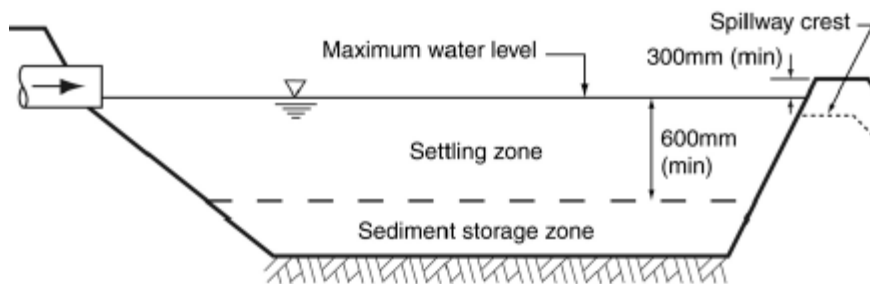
Typical Type D sediment dam cross section (IECA, 2008)
